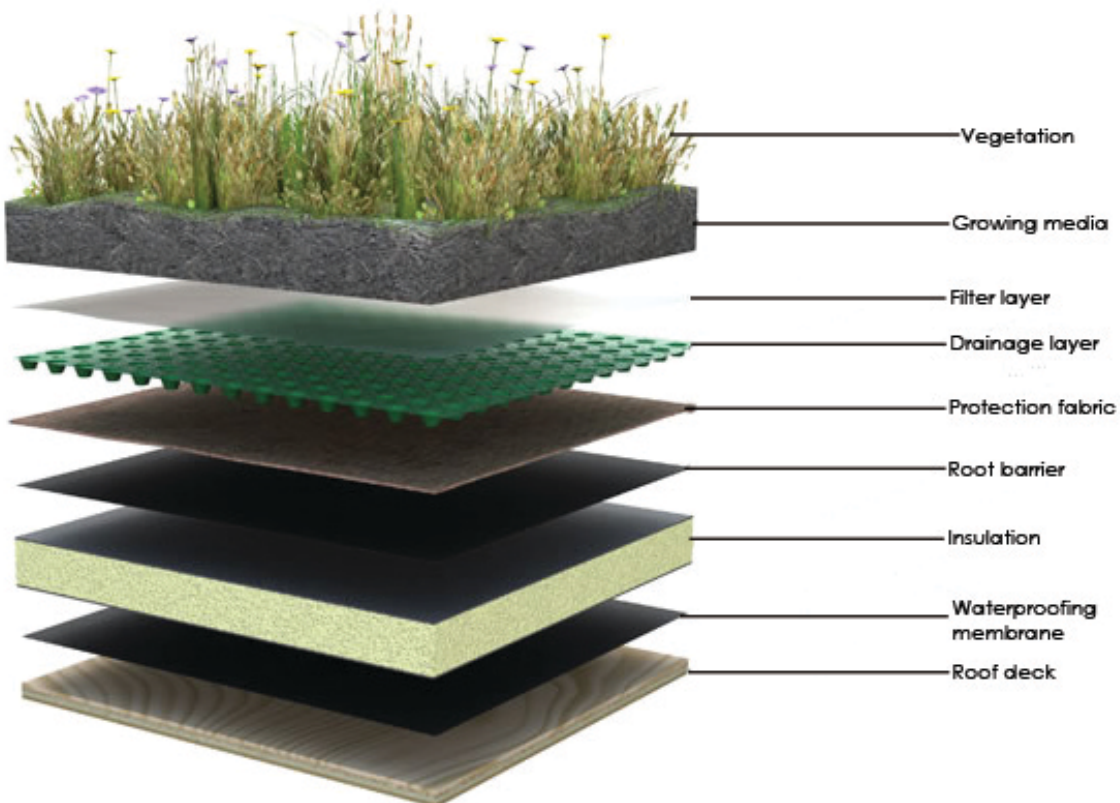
Extensive Green Roof System Source: Capitol Greenroofs
